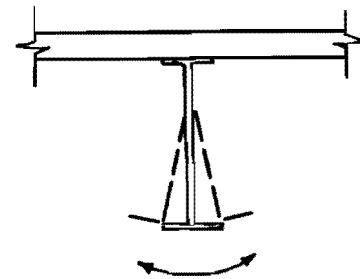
Arrangement of cross girders. (Ref. 33.)
